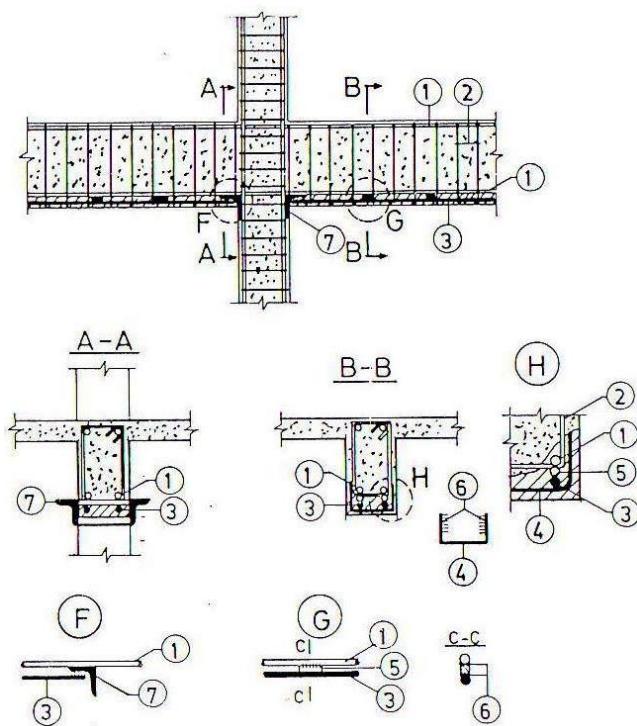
Strengthening of a beam on the lower face; 1-existing reinforcement, 2-existing stirrups, 3-added longitudinal reinforcement, 4-added stirrups, 5-welded connecting bar, 6-welding, 7-collar of angle profiles.
